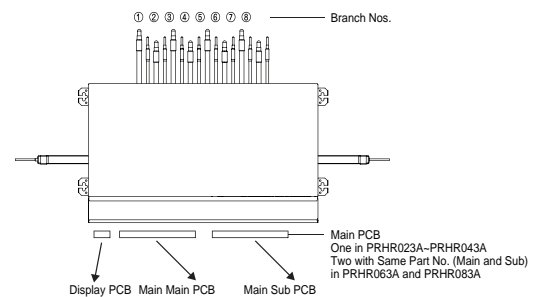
Heat Recovery Unit PCB Locations, Top View.
